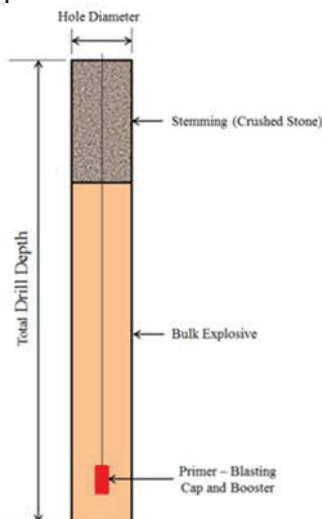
Typical Drill Hole Profile Shown as Loaded With Explosives
